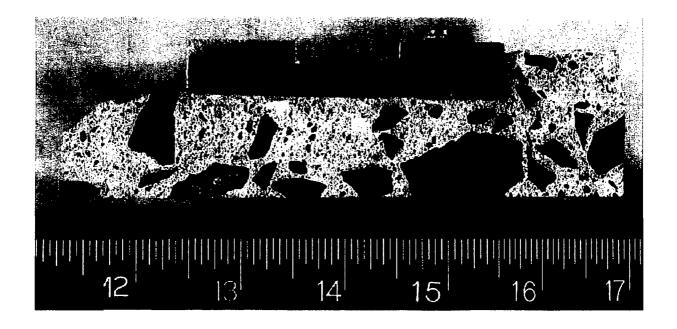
Cross-section view of Core 123, Section 1 (lapped surface). The upper left portion of the specimen was fractured during the removal of the stainless steel liner (see Figure 2).
